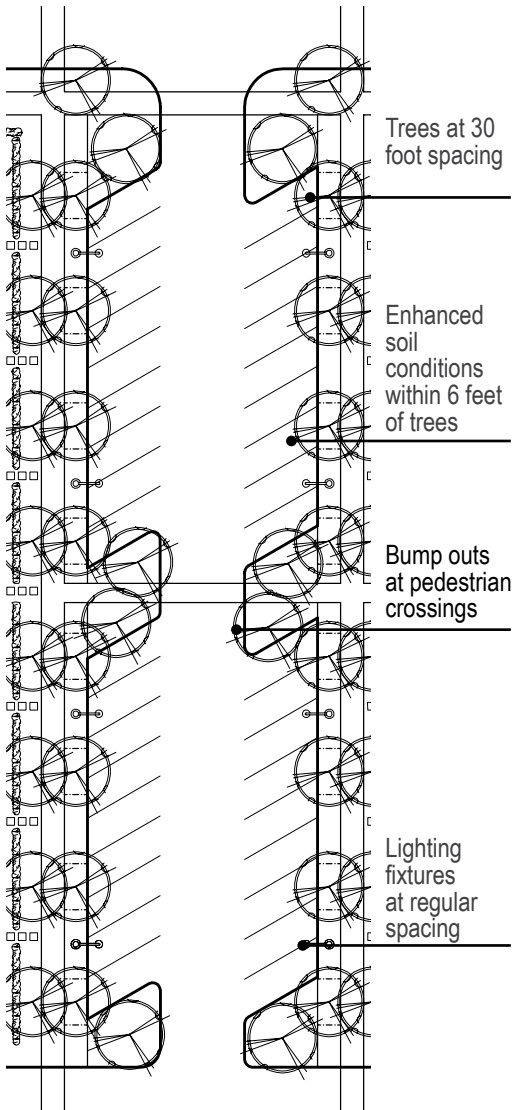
S3.f: Plan view of primary internal drive showing optional angle parking.
